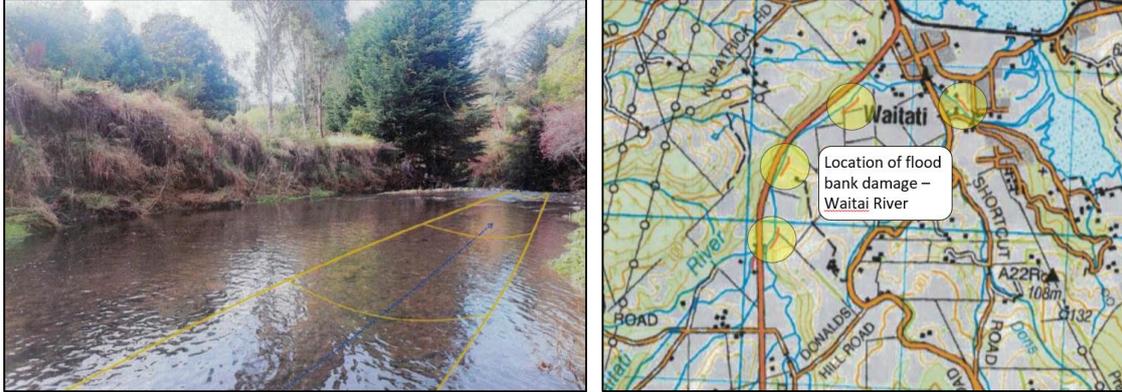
Waitati River Bank flood damage - 2017 floods (left) and location of repairs (right).
